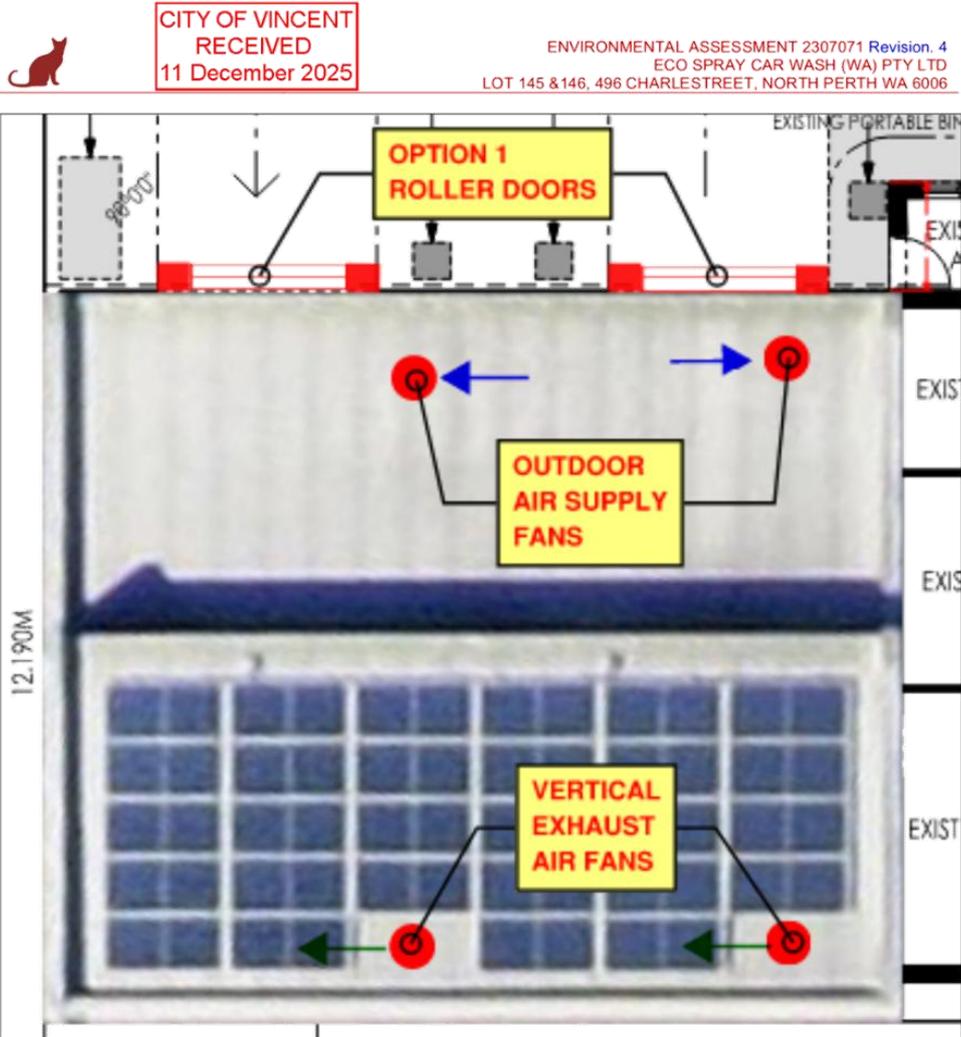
GENERAL ARRANGEMENT VENTILATION FANS
